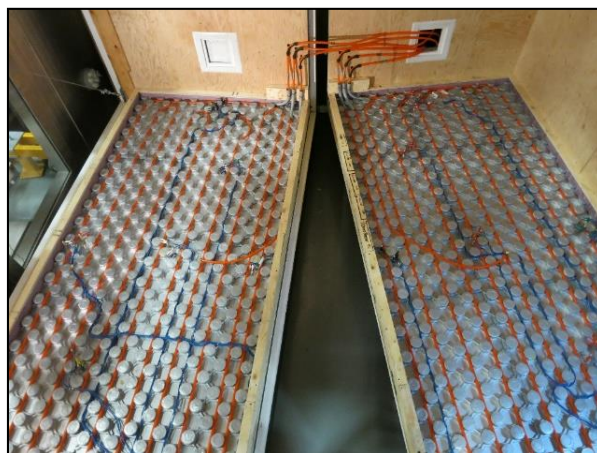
Front and back sections of the embedded-tube radiant floor set-up
